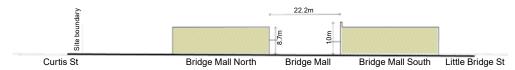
Built form test of street wall, setback and upper level heights- Section F
